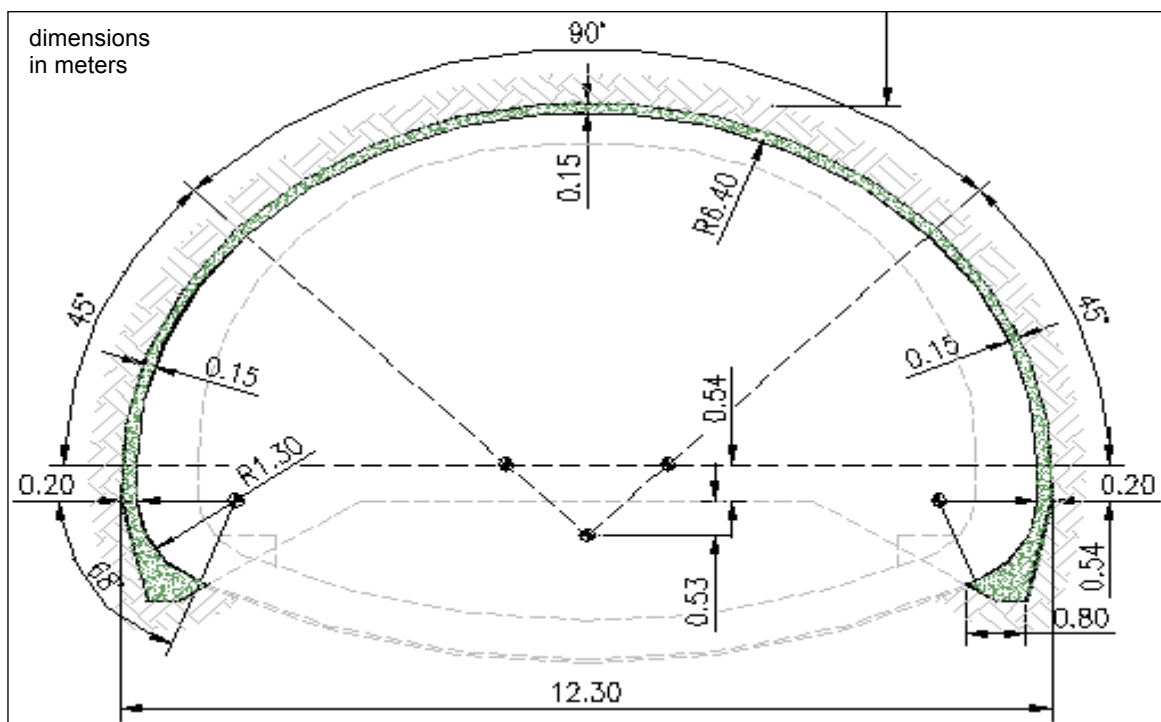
Cross section of a typical two lane, full face tunnel, lines B and H.
